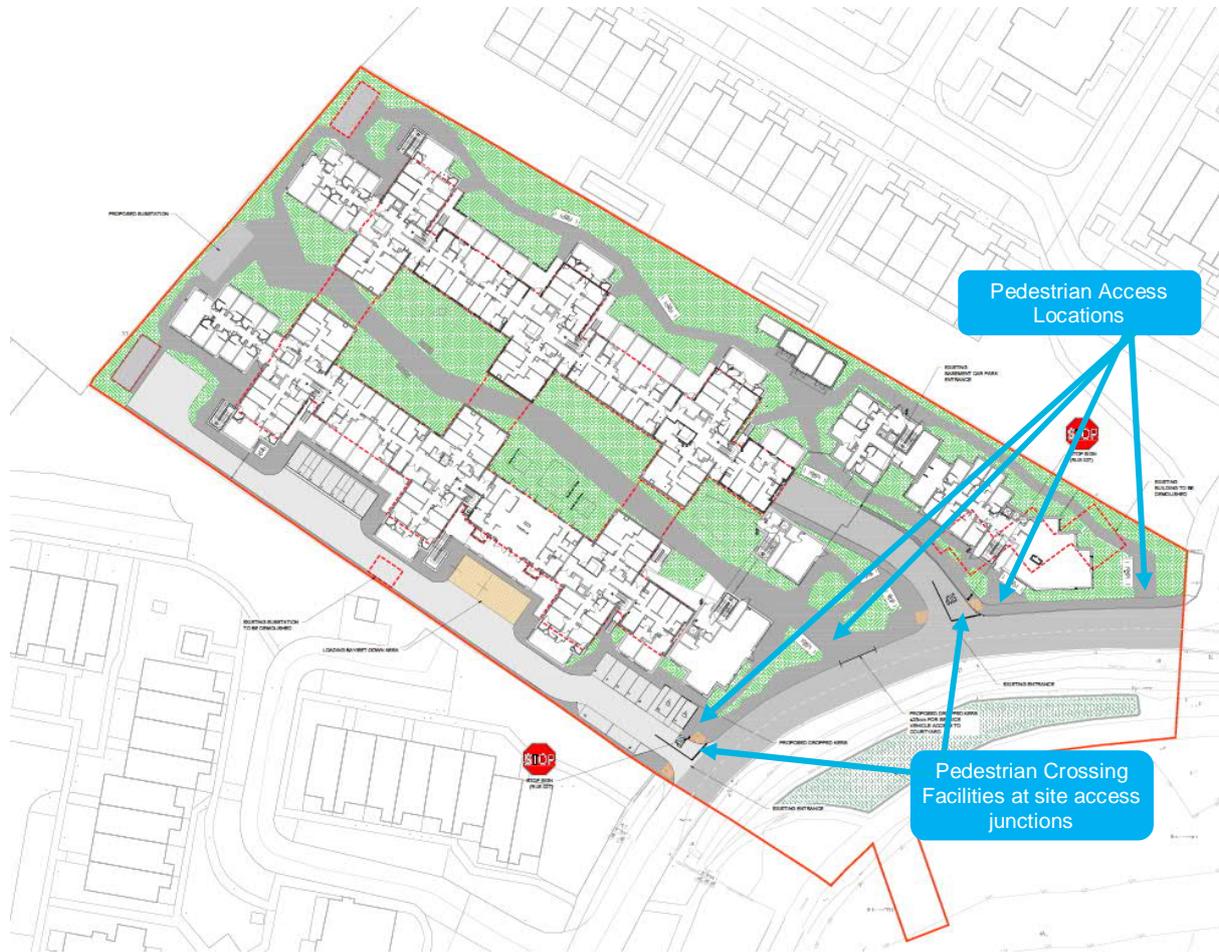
Proposed Site Layout with Pedestrian Connections/Facilities
